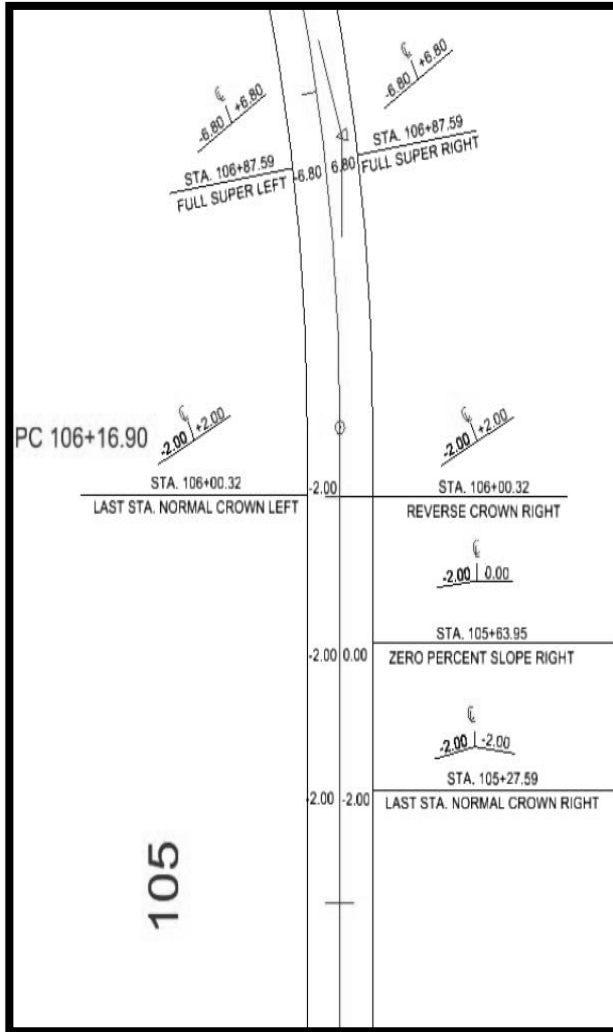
STATIONS AND CROSS SLOPES BEFORE FULL SUPERELEVATION
